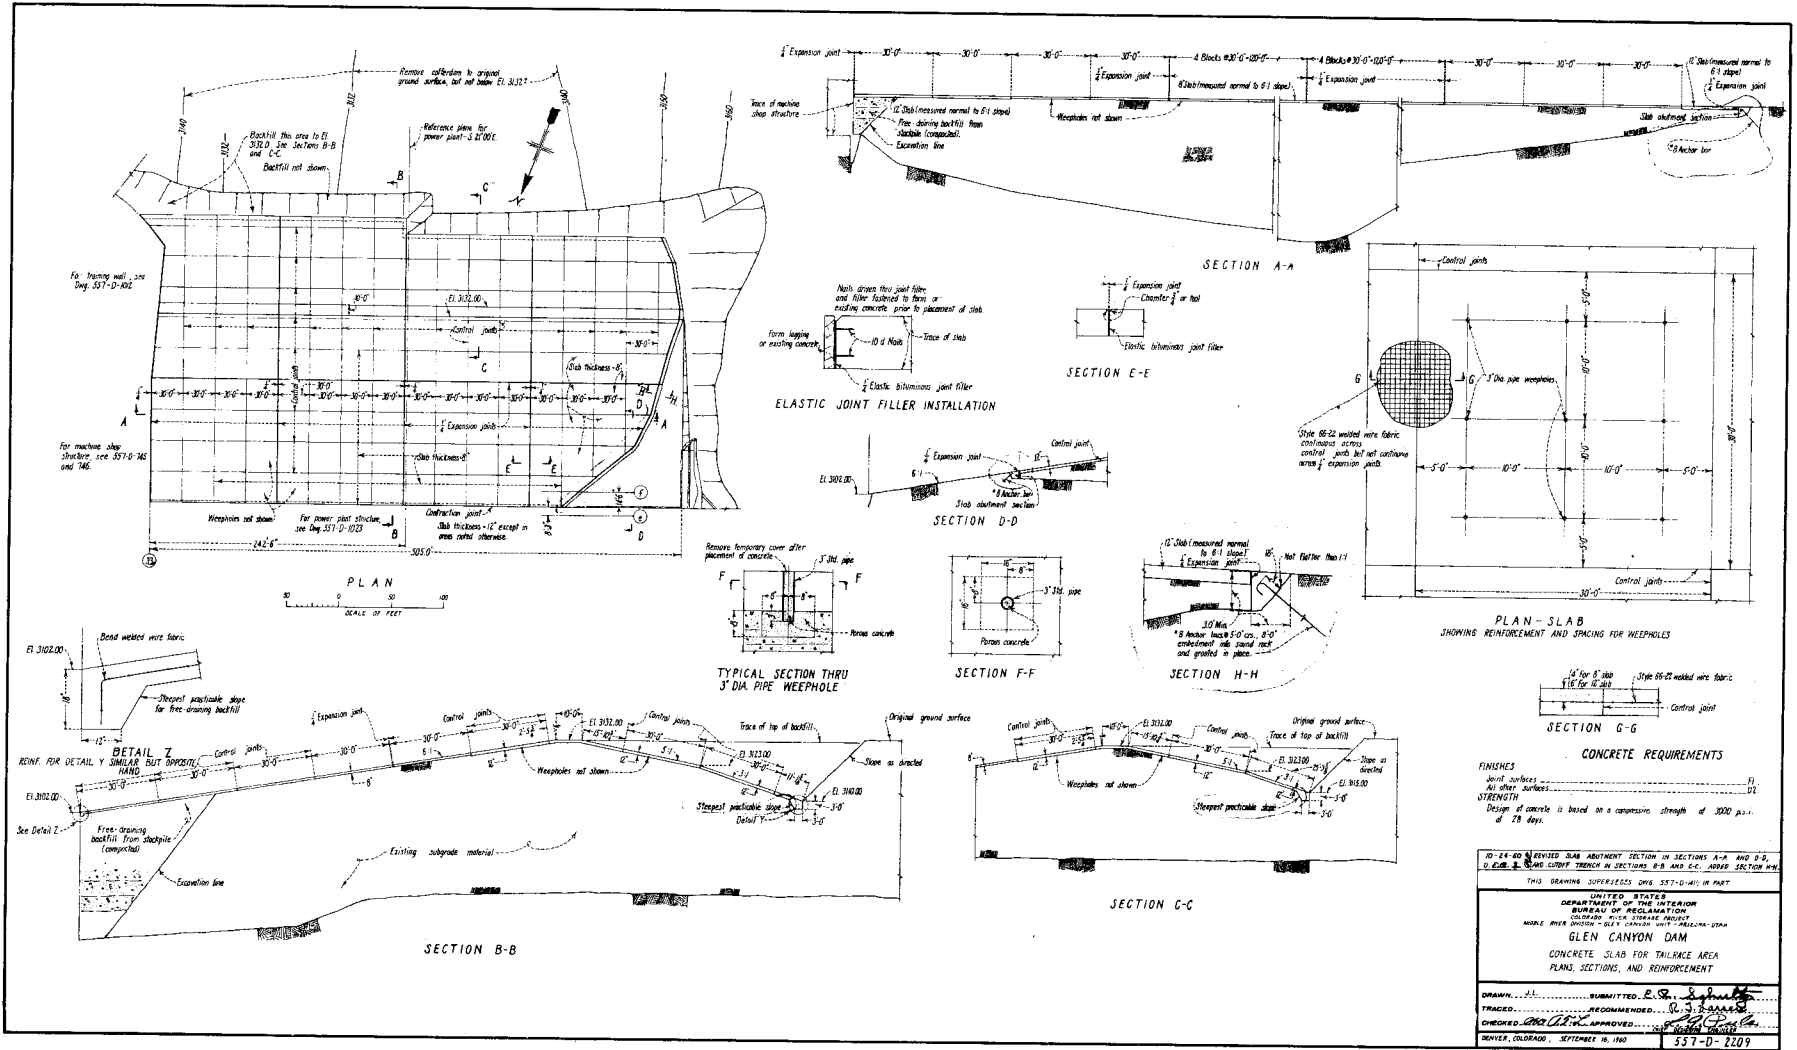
Concrete slab for tailrace area—Plans, sections, and reinforcement.
